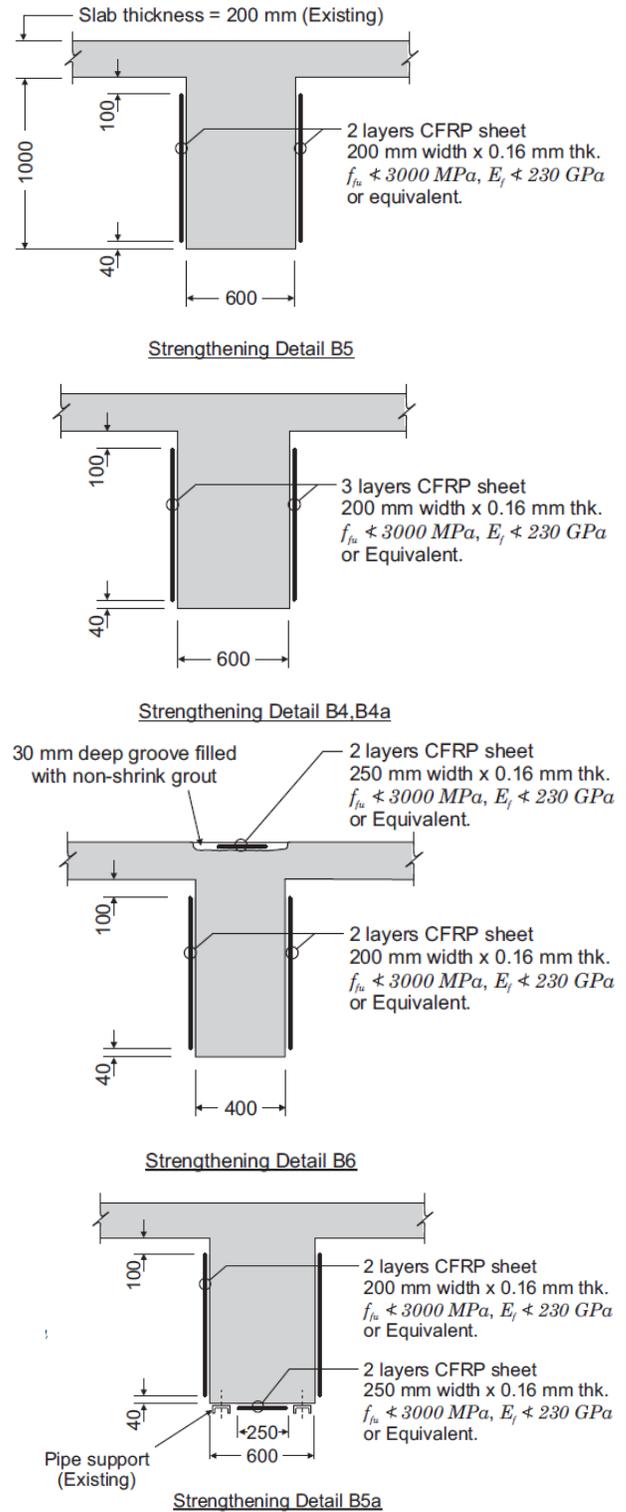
Shear strengthening EBR details for RC beams on the 2nd floor
